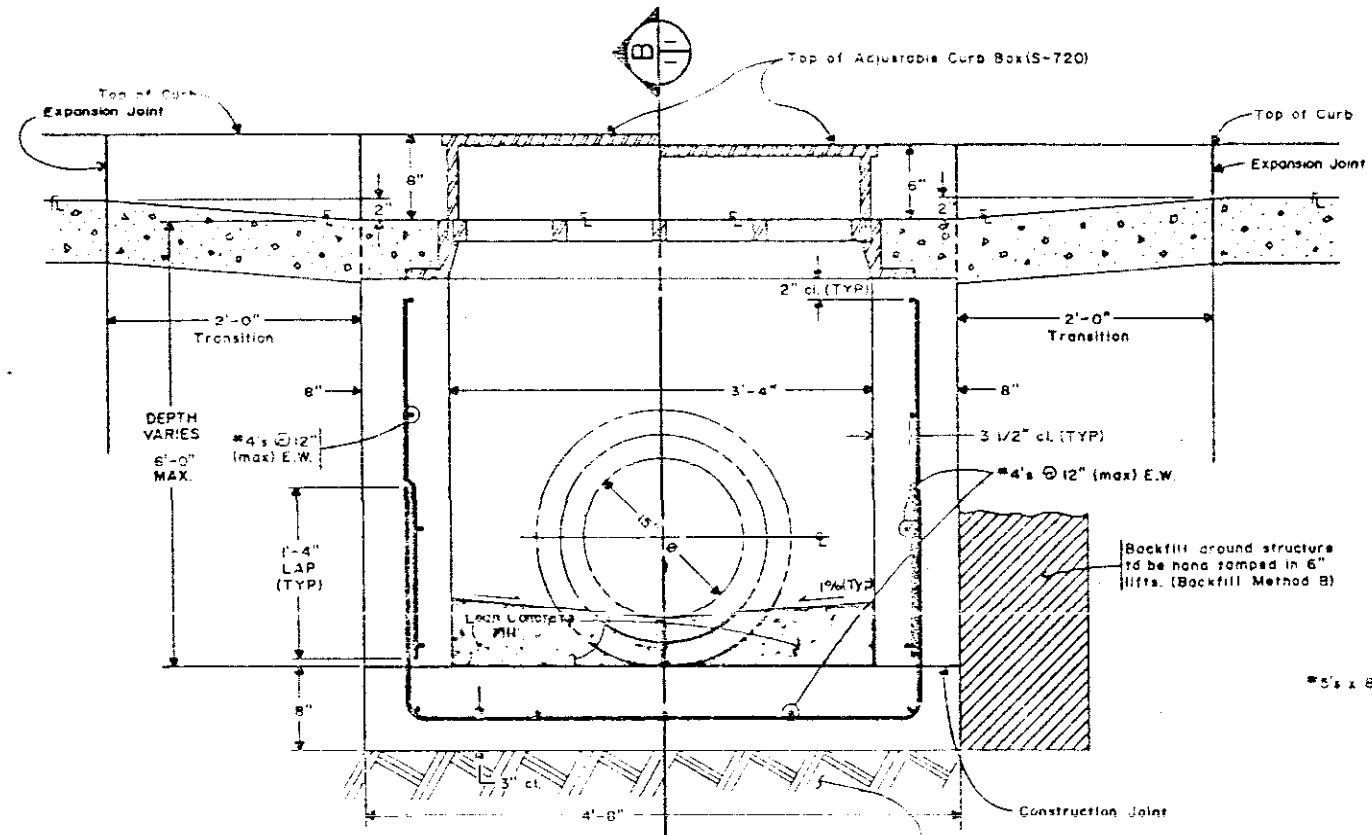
DETAIL Vertical Wall Bar Back Wall (Typ.) NOT TO SCALE
